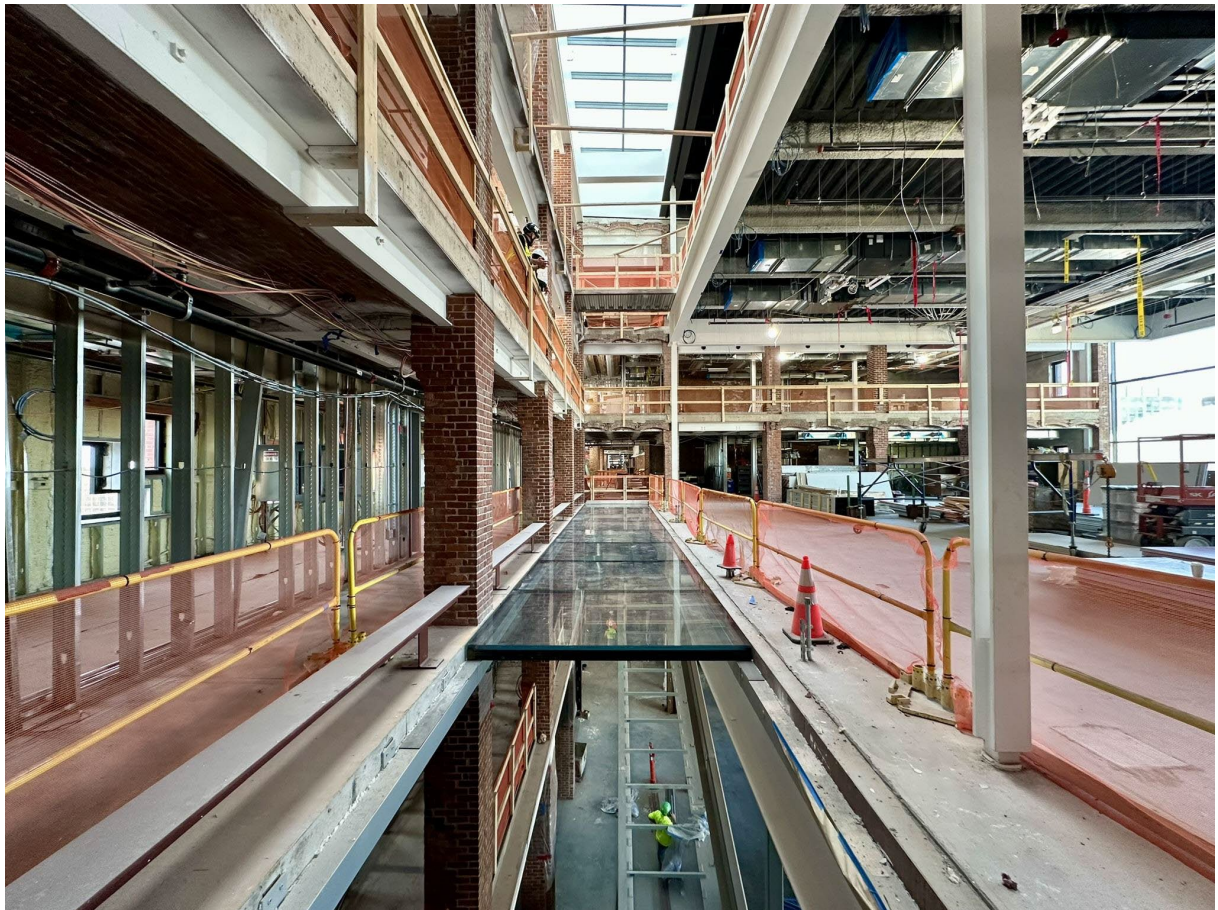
New atrium space under construction within the Metropolitan Warehouse.
